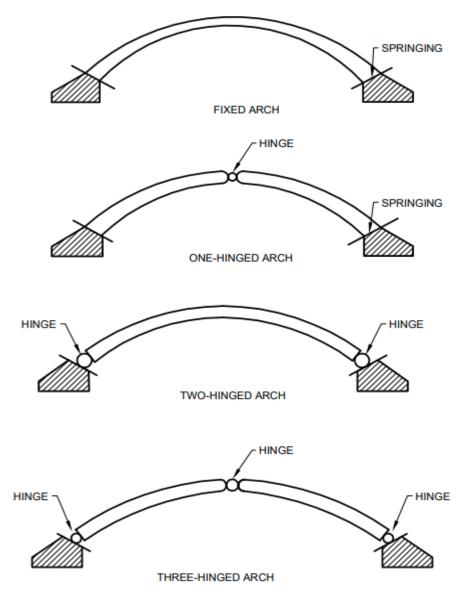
STRUCTURAL CLASSIFICATION OF CONCRETE ARCH
